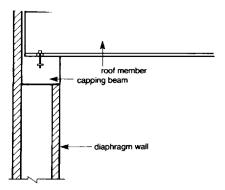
Capping beam to transmit horizontal forces from the wall to the roof in the propped cantilever system
